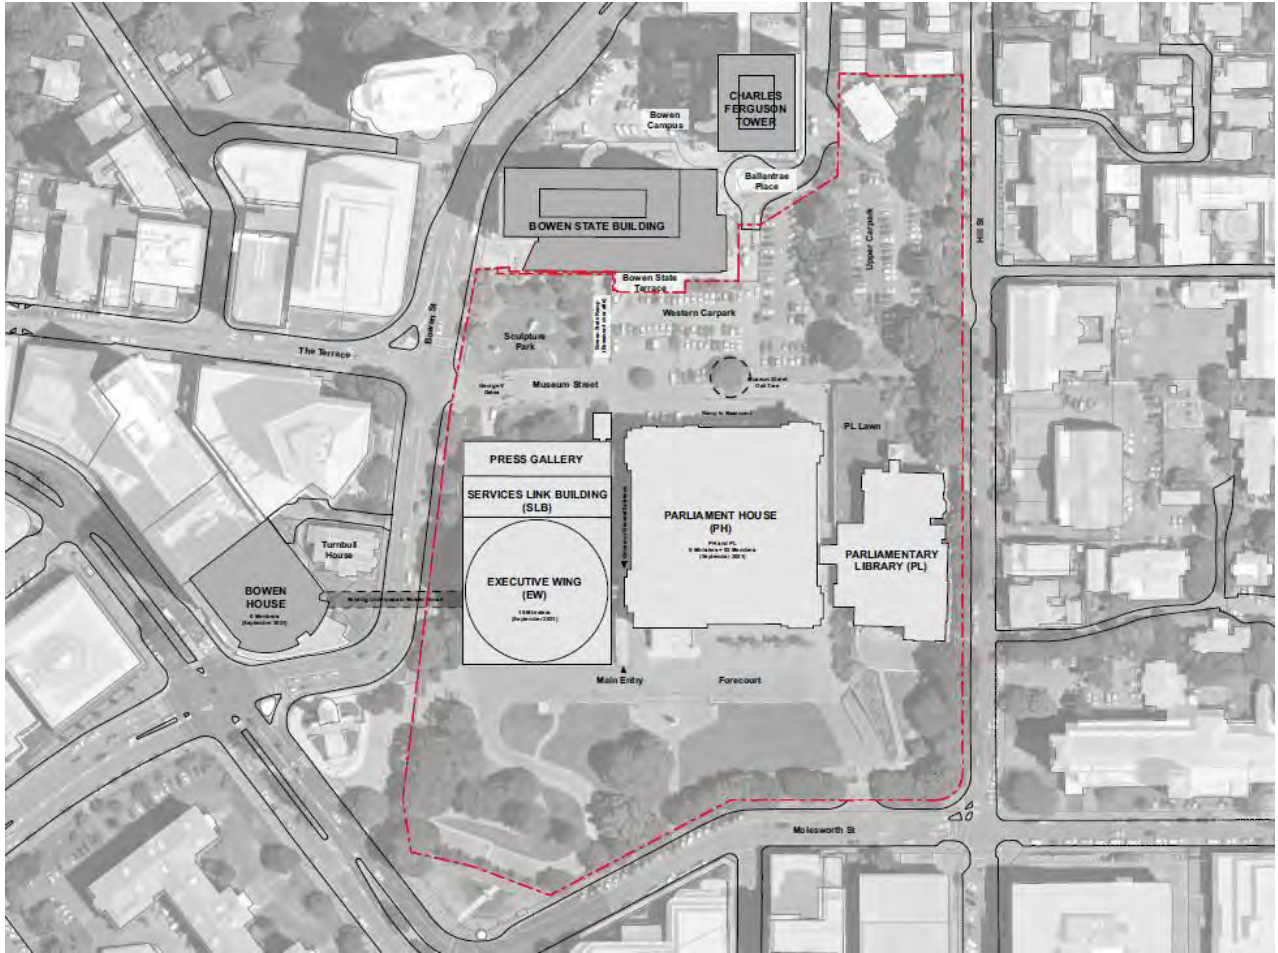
Existing Site Plan - Location Plan, Layout I.D P A1-01, revision 2 prepared by Studio Pacific Architecture.
